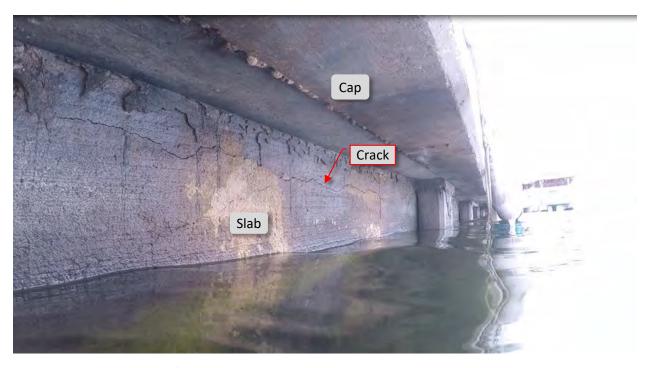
S8. 3+33 - 3+41. Crack/spall at top of slab.
